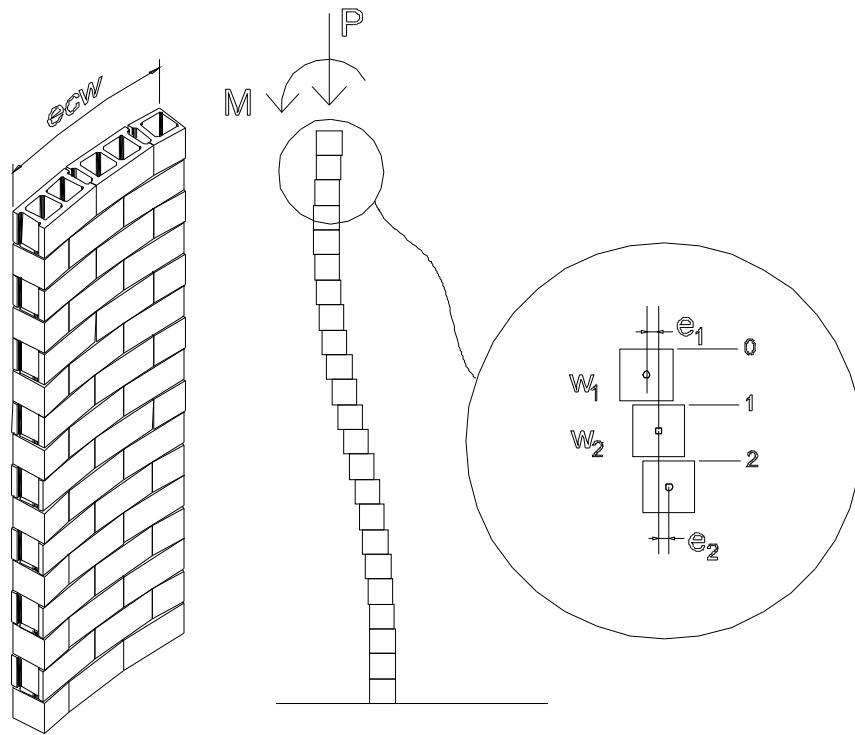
Vertical Section for Wall Flexural Reinforcement Calculation.
